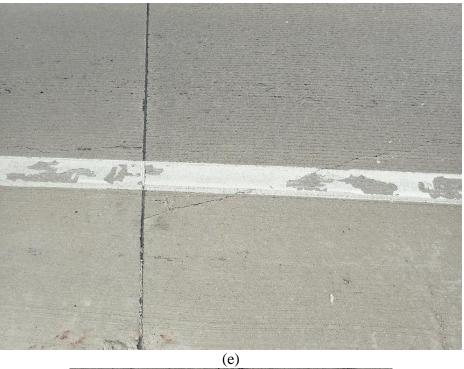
Pavement at LC Site 1 – US 151 in Linn County
